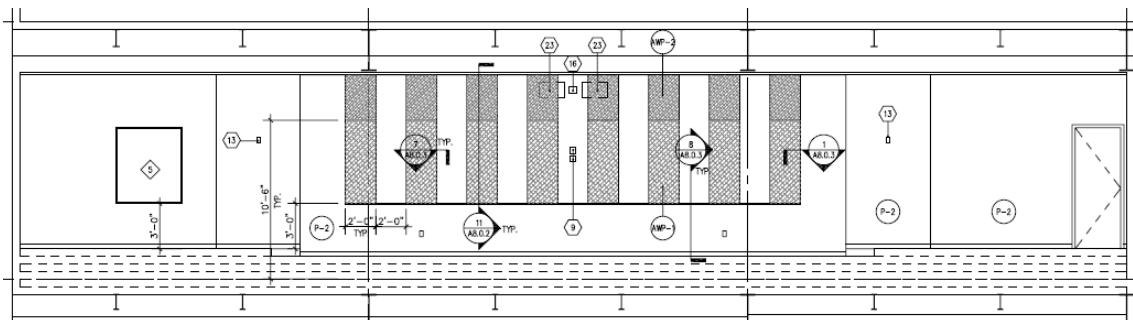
135-Seat Classroom Back Elevation/Section
